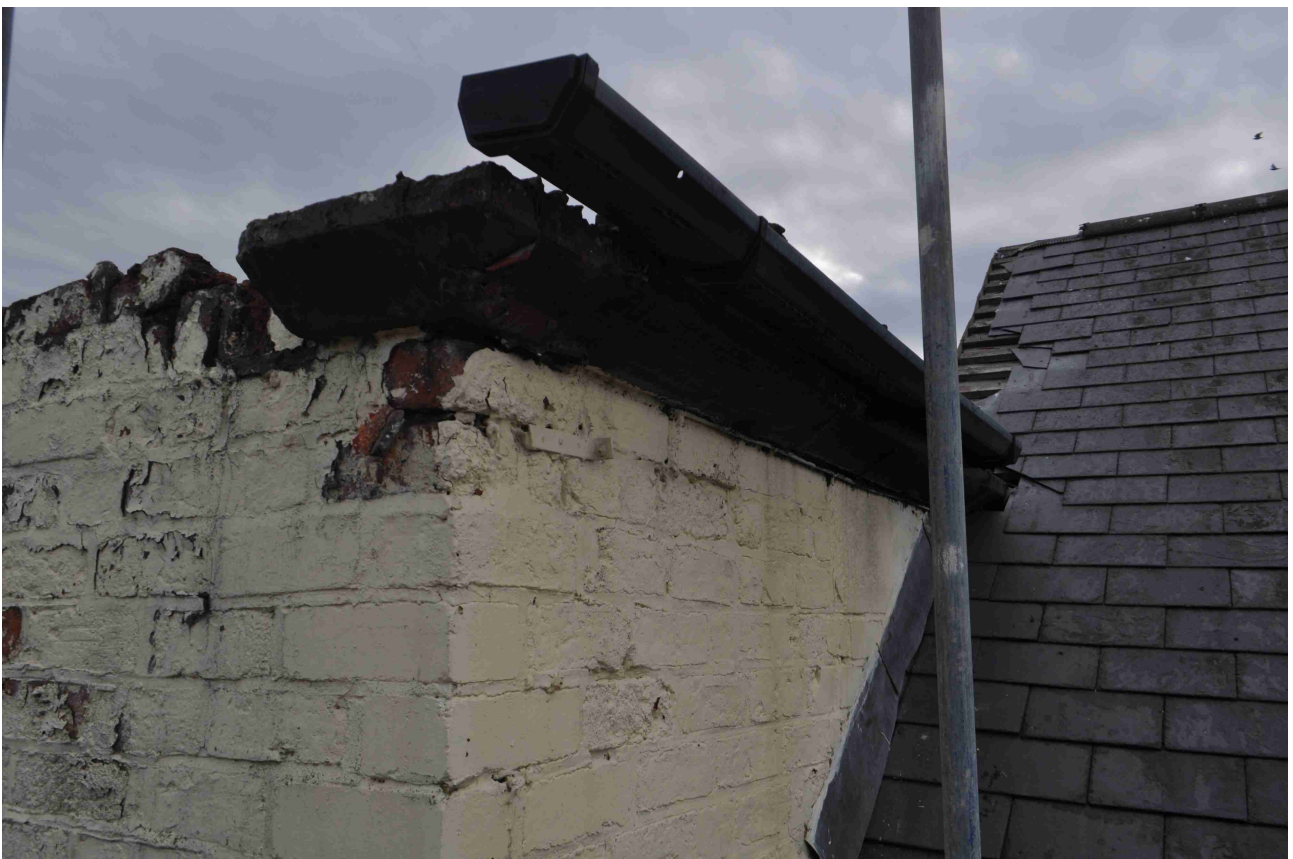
Photo 45. Northwest end of architrave surmounting southwest facing wall from underneath.
